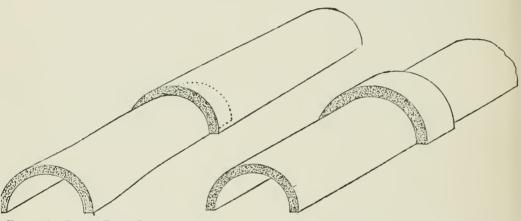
RIDGE TILES INTERLOCKING. FIG. 147.—RIDGE TILES WITH LOOSE PIECES FOR COVERING JOINT.
